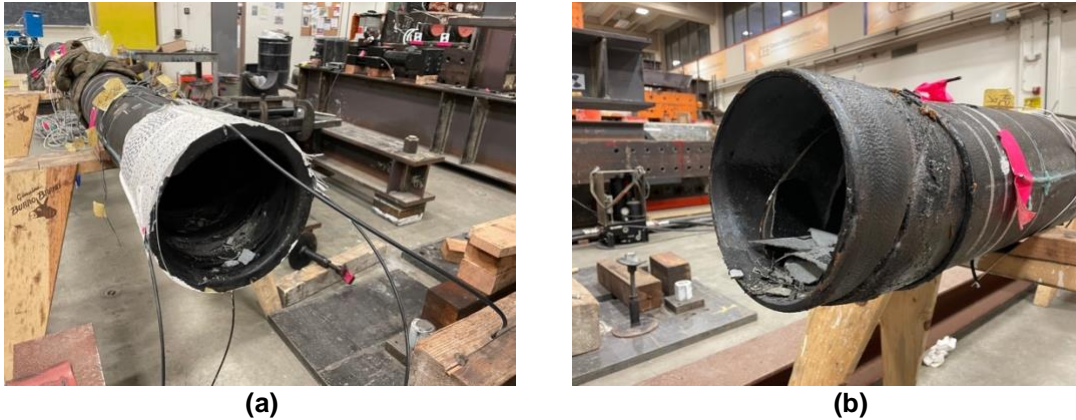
Failure of Specimen 2. (a) Bell, (b) Spigot
